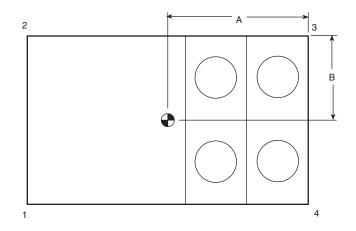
Base Unit Dimensions — 48EW, EY054-068
